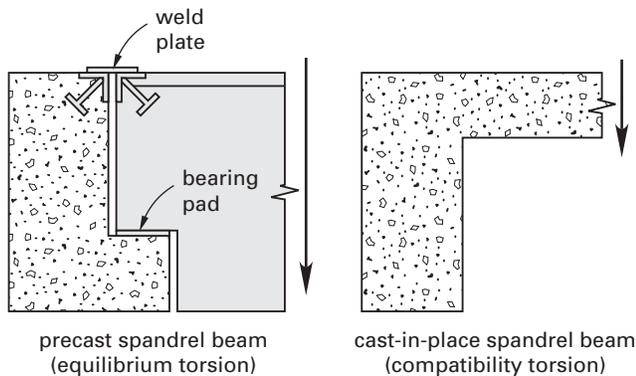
Sections Through Precast and Cast-in-Place Spandrel Beams
